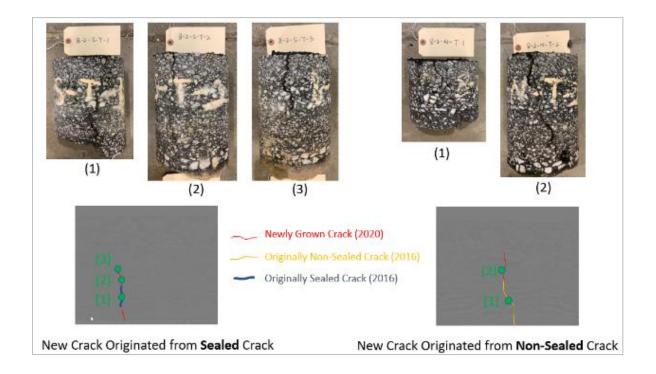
Photo. New Crack Originated from Sealed and Non-sealed Crack
